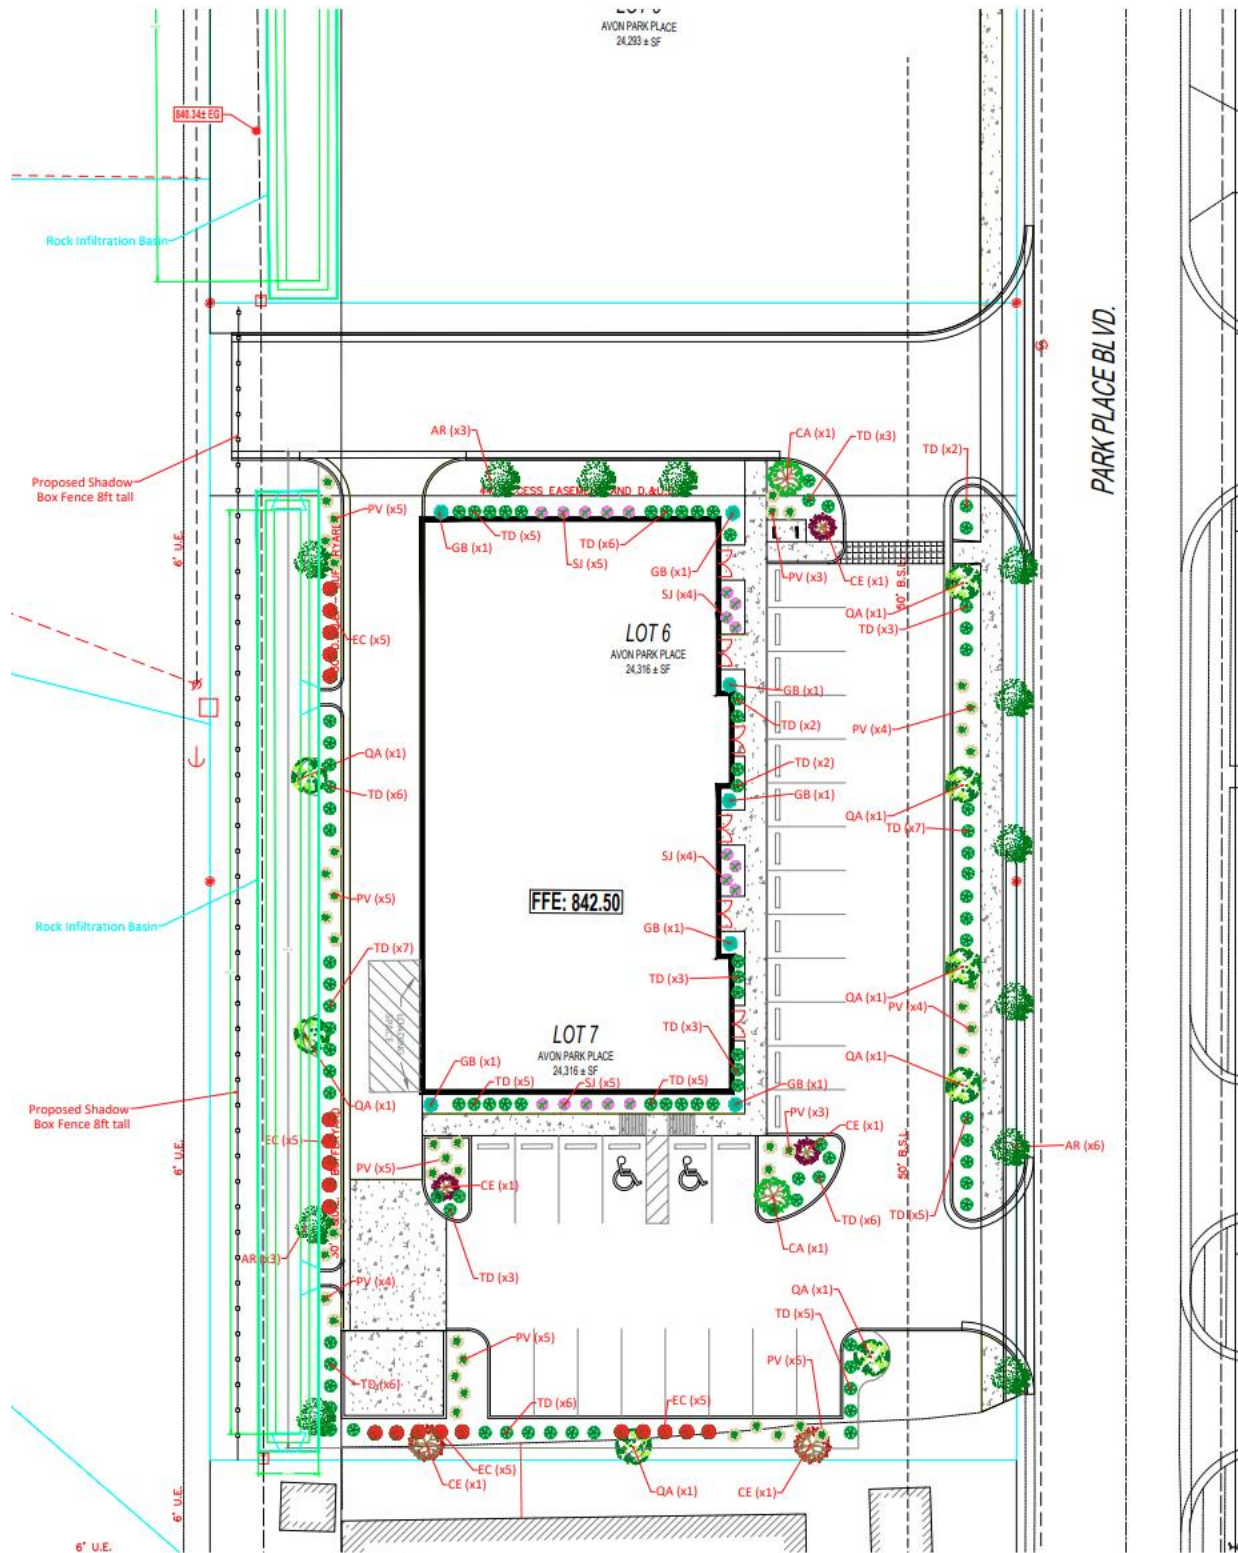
Revised Site Plan (6-Feb-2026)
